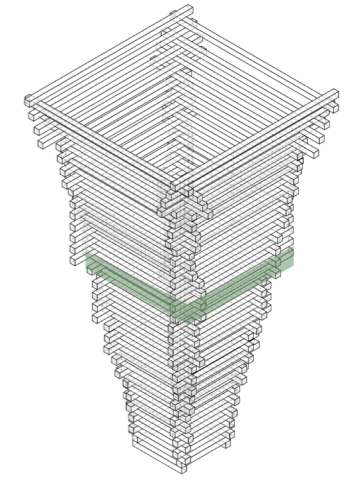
Discrete system column by horizontally stacking orthogonal beams (Own work, 2024)
